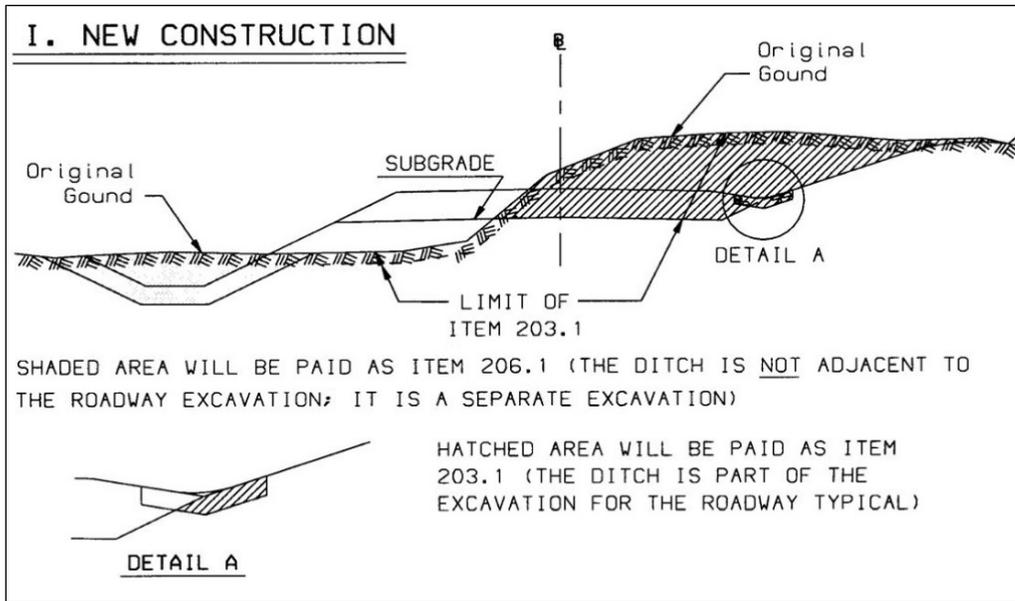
3: Roadway and Ditch Excavation Pay Limits – New Construction
